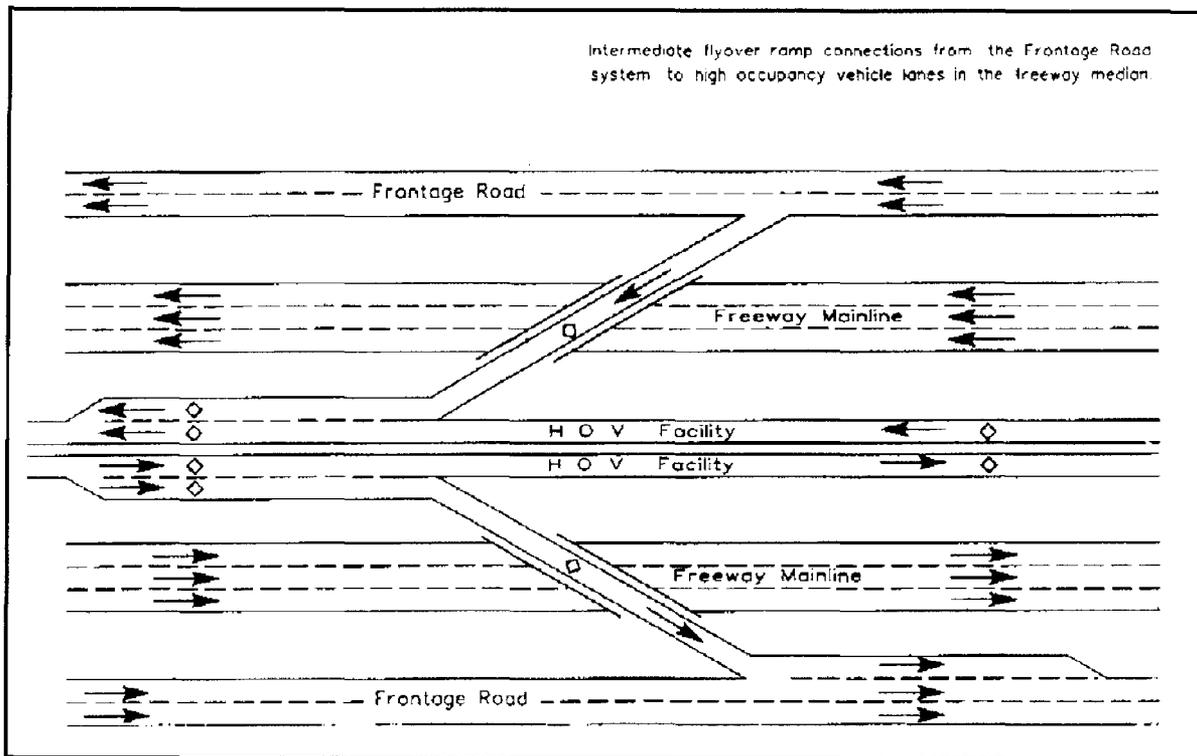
Intermediate Flyover to Frontage Road.⁽¹⁰⁾
